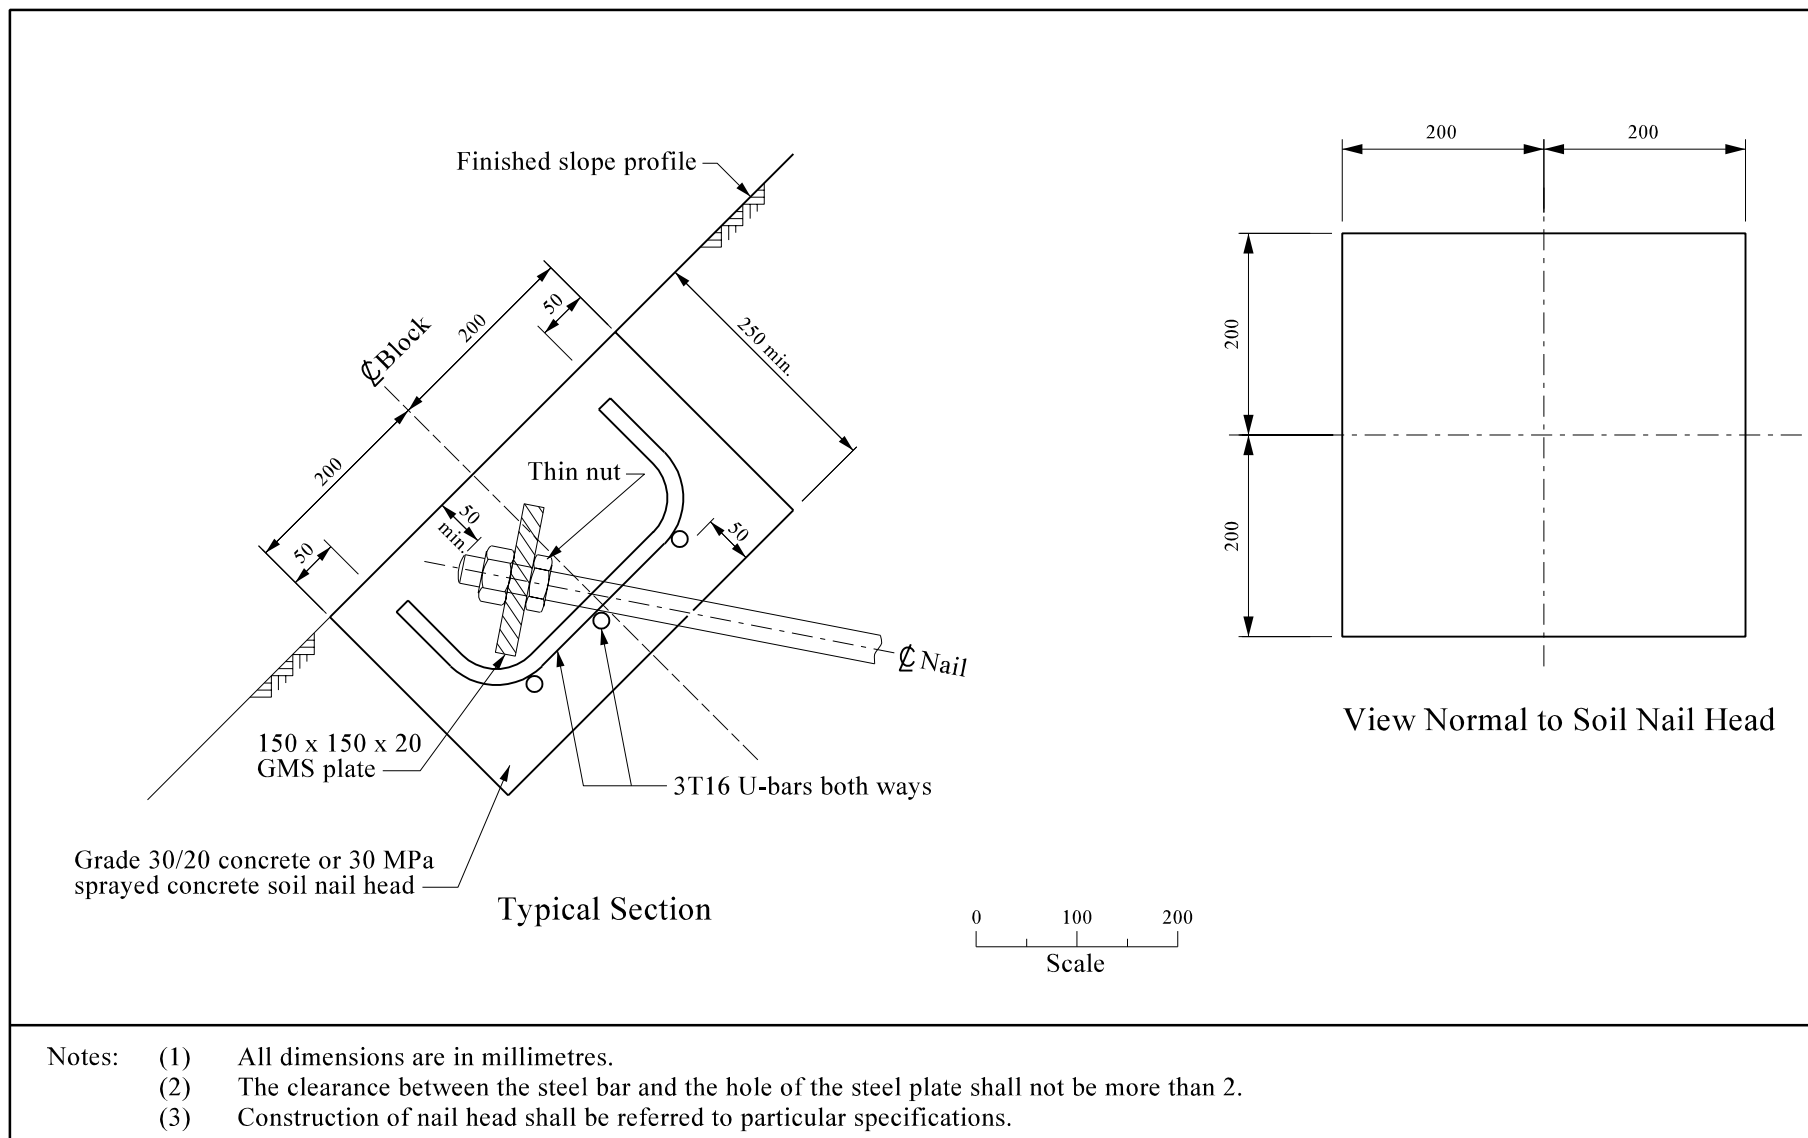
Typical Soil Nail Head Details (after CEDD Drawing No. C2106/2D)
